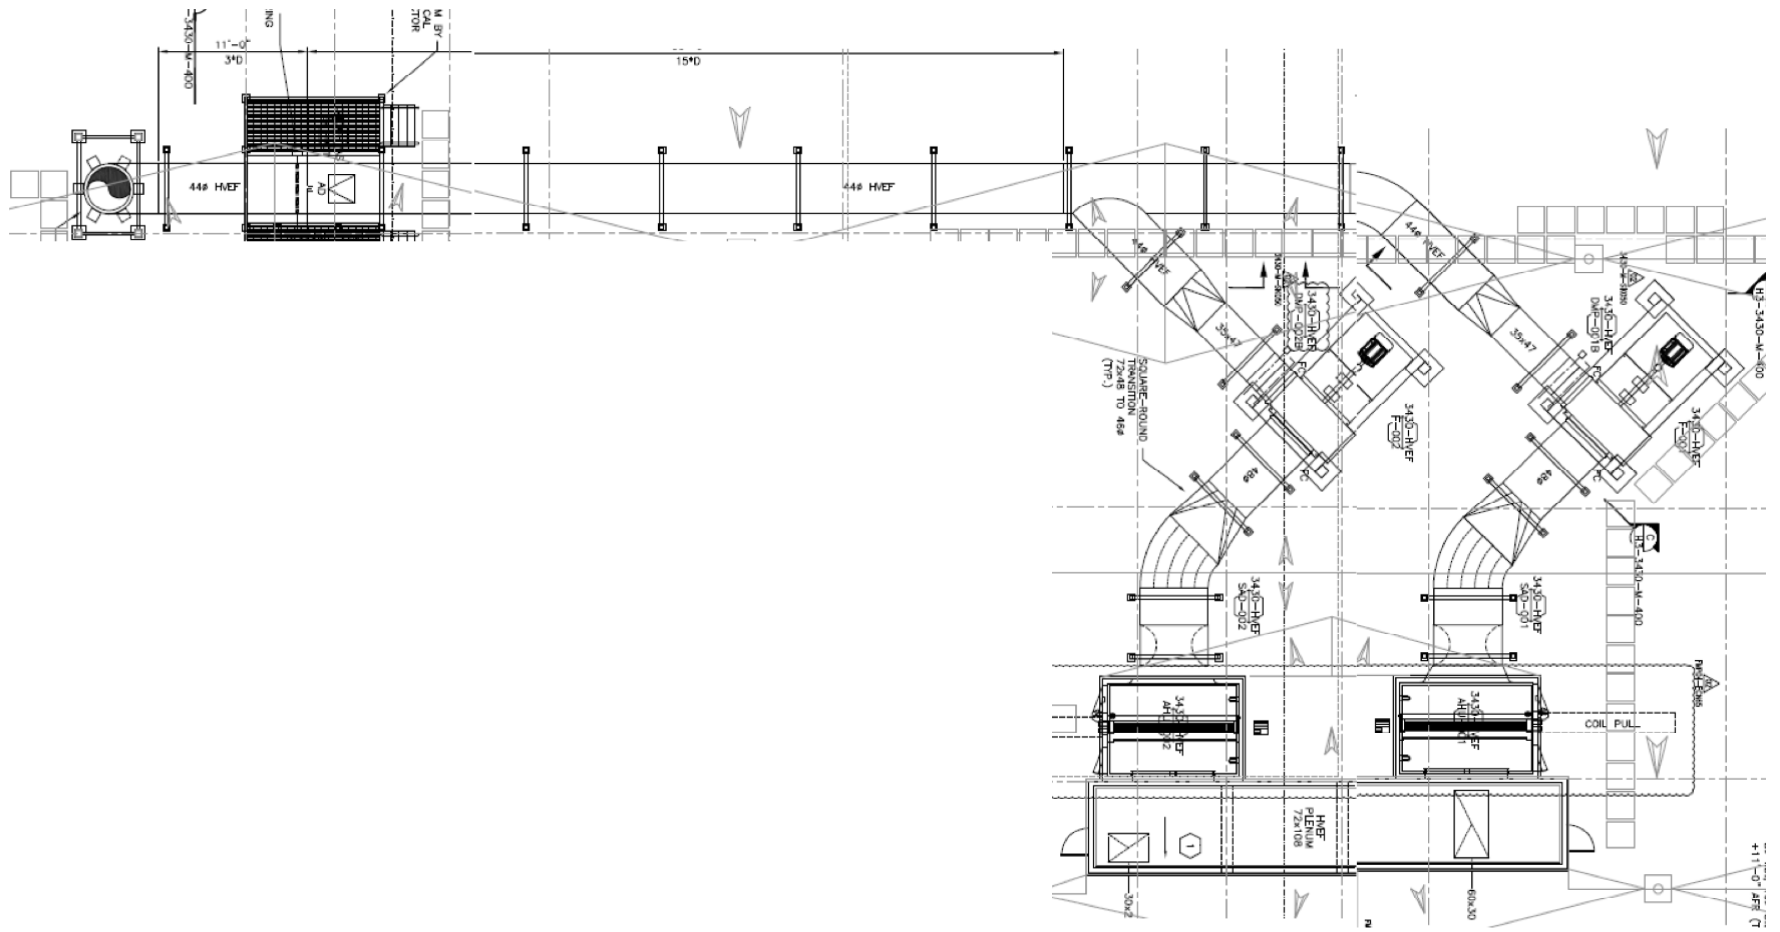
Plan View of 3430 Building Filtered Exhaust Stack
